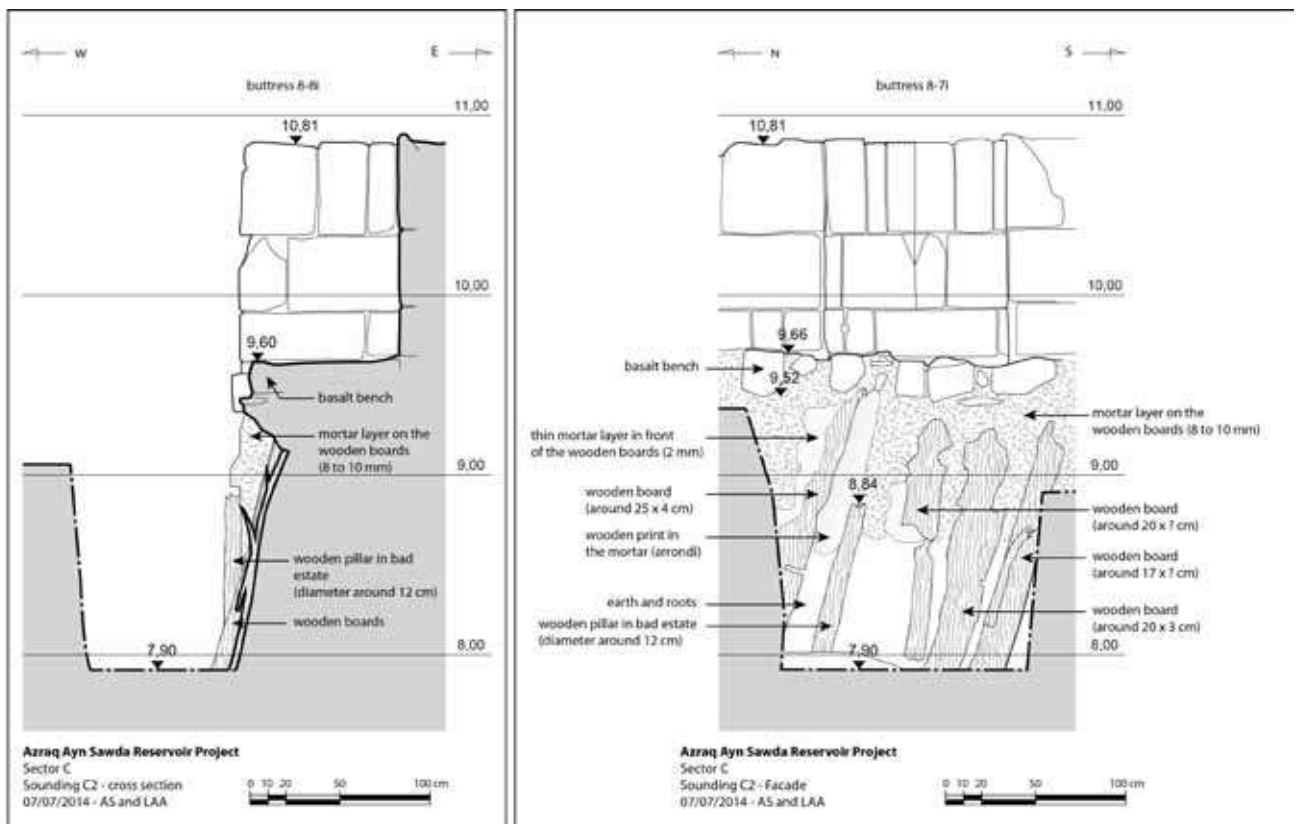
Cross section and facade of sounding C2 (AS and LAA 2014).
